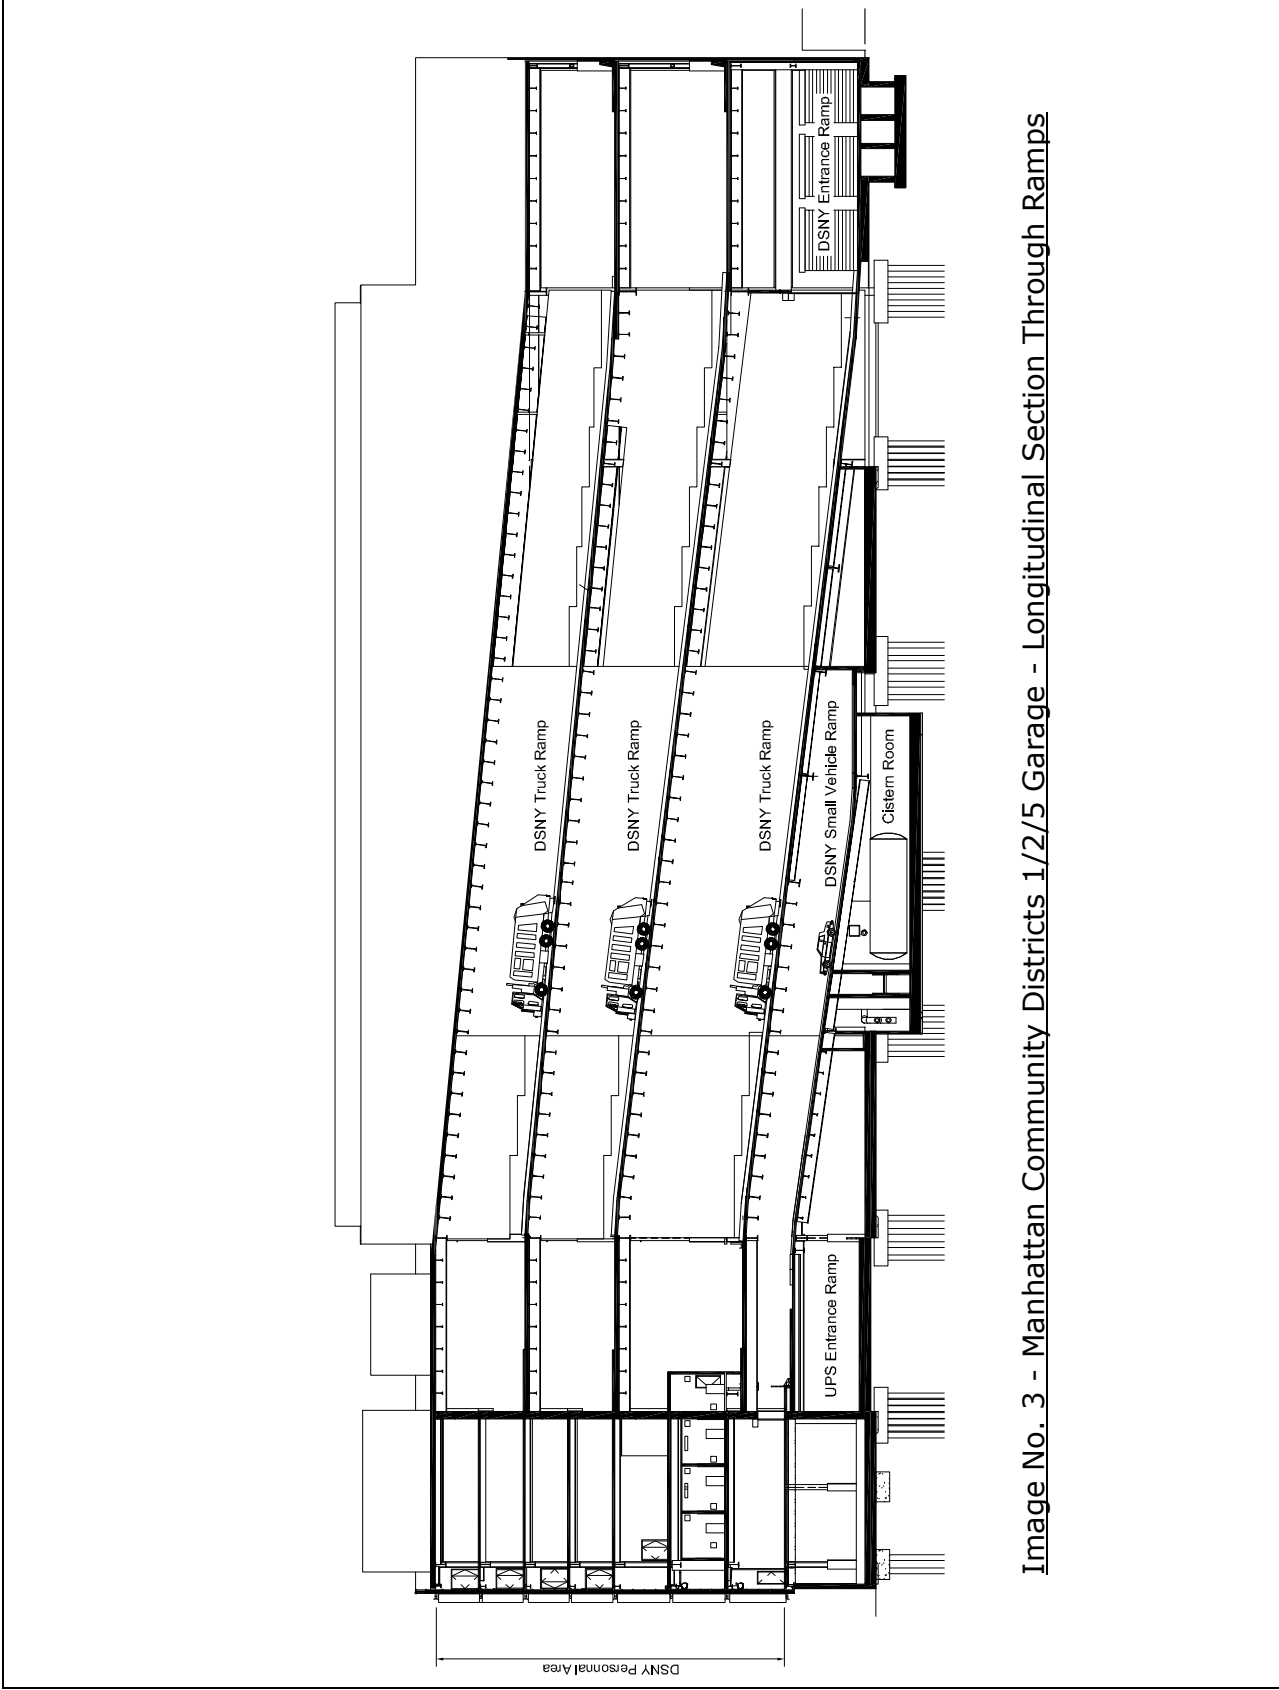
Manhattan Community Districts 1/2/5 Garage - Longitudinal Section Through Ramps
